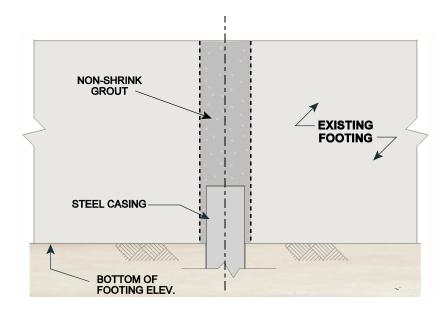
12. Pile to Existing Footing Connection Detail – Compression Only.
